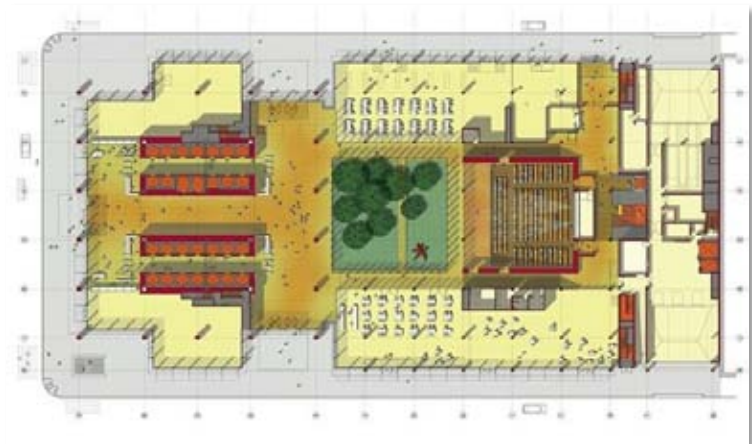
GROUND FLOOR, NEW YORK TIMES BUILDING
